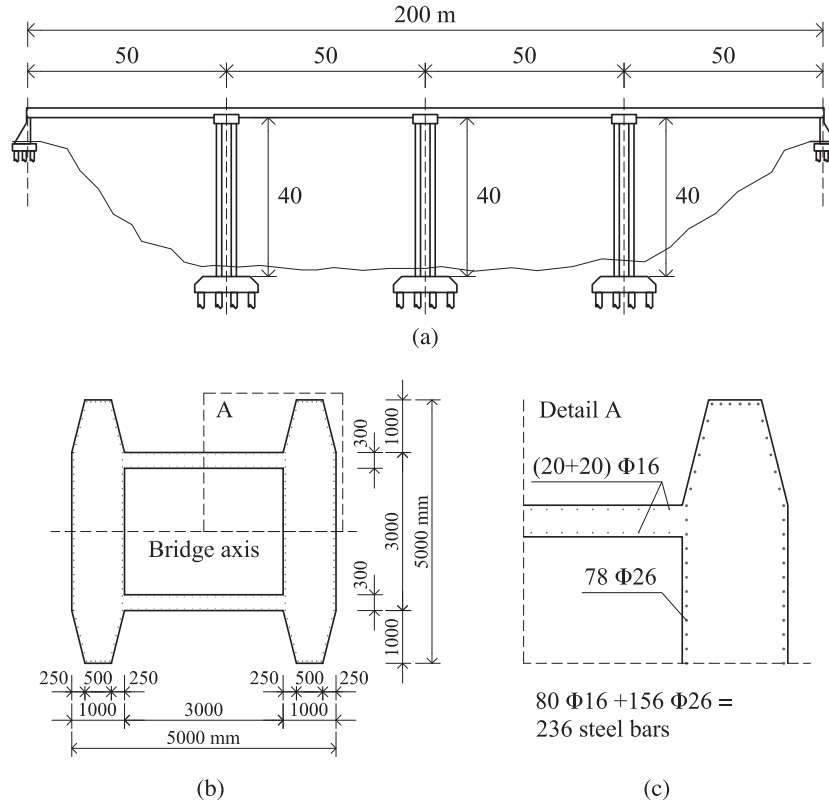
Continuous bridge. (a) Overall dimensions of the bridge. (b) Geometry, dimensions, and (c) detail of the reinforcement layout of the cross-section of the piers.
